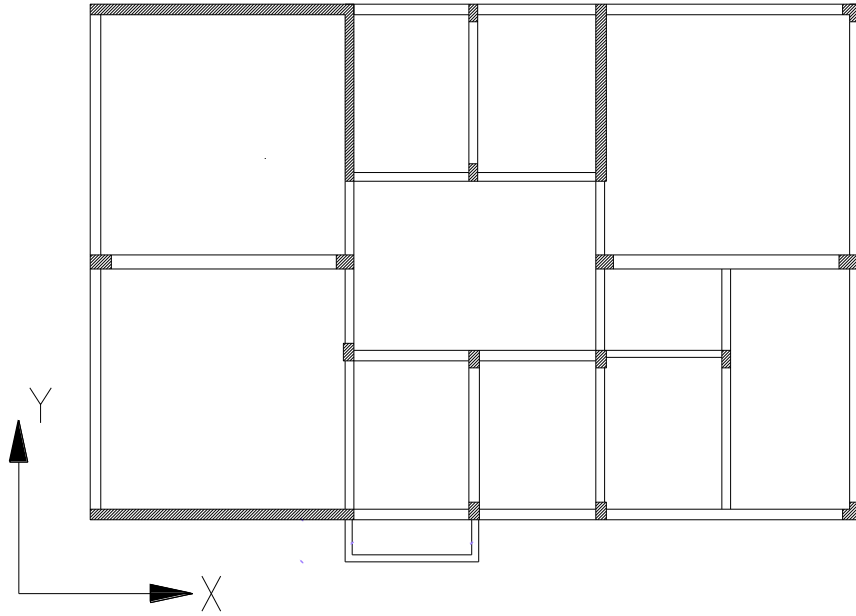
Plan View of Güngören Haznedar Abdi İpekçi Primary School Block B
